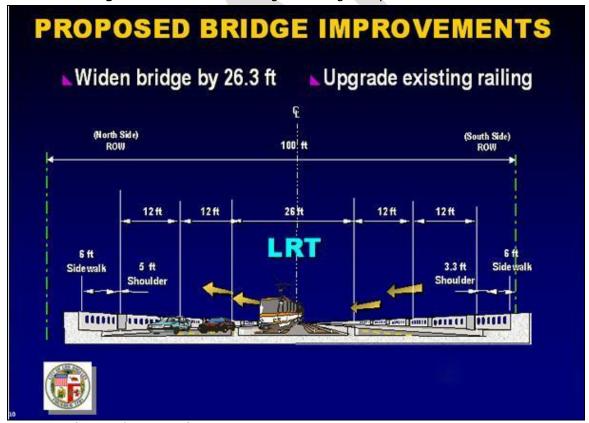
First Street Bridge Widening – Proposed Cross-Section
